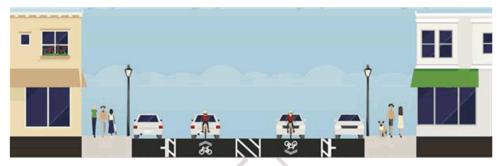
Potential cross section of Newcastle Street (slow speed mixed traffic).
